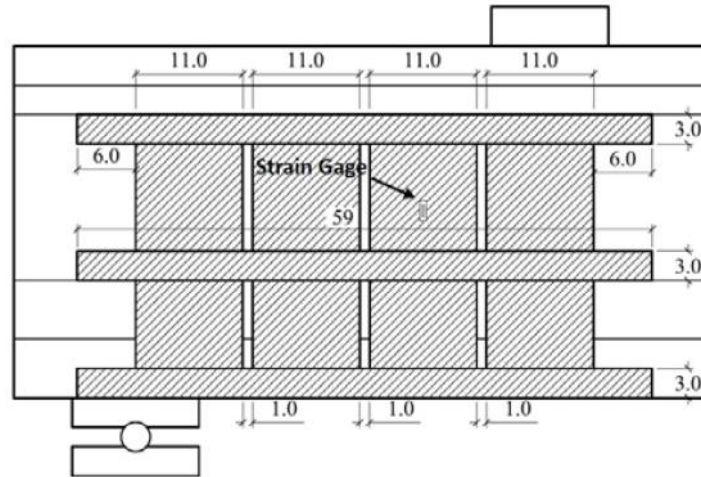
Longitudinal FRP Strip Anchorage Detailing for Full-Scale Specimens (from Andrawes et al. 2018)
